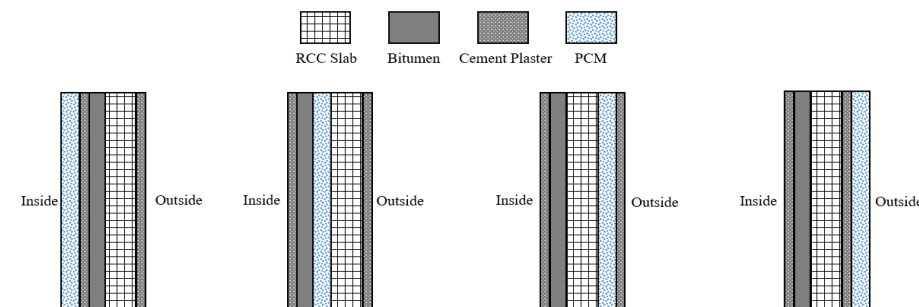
PCM Placement in Roof a) Roof A b) Roof B c) Roof C d) Roof D
